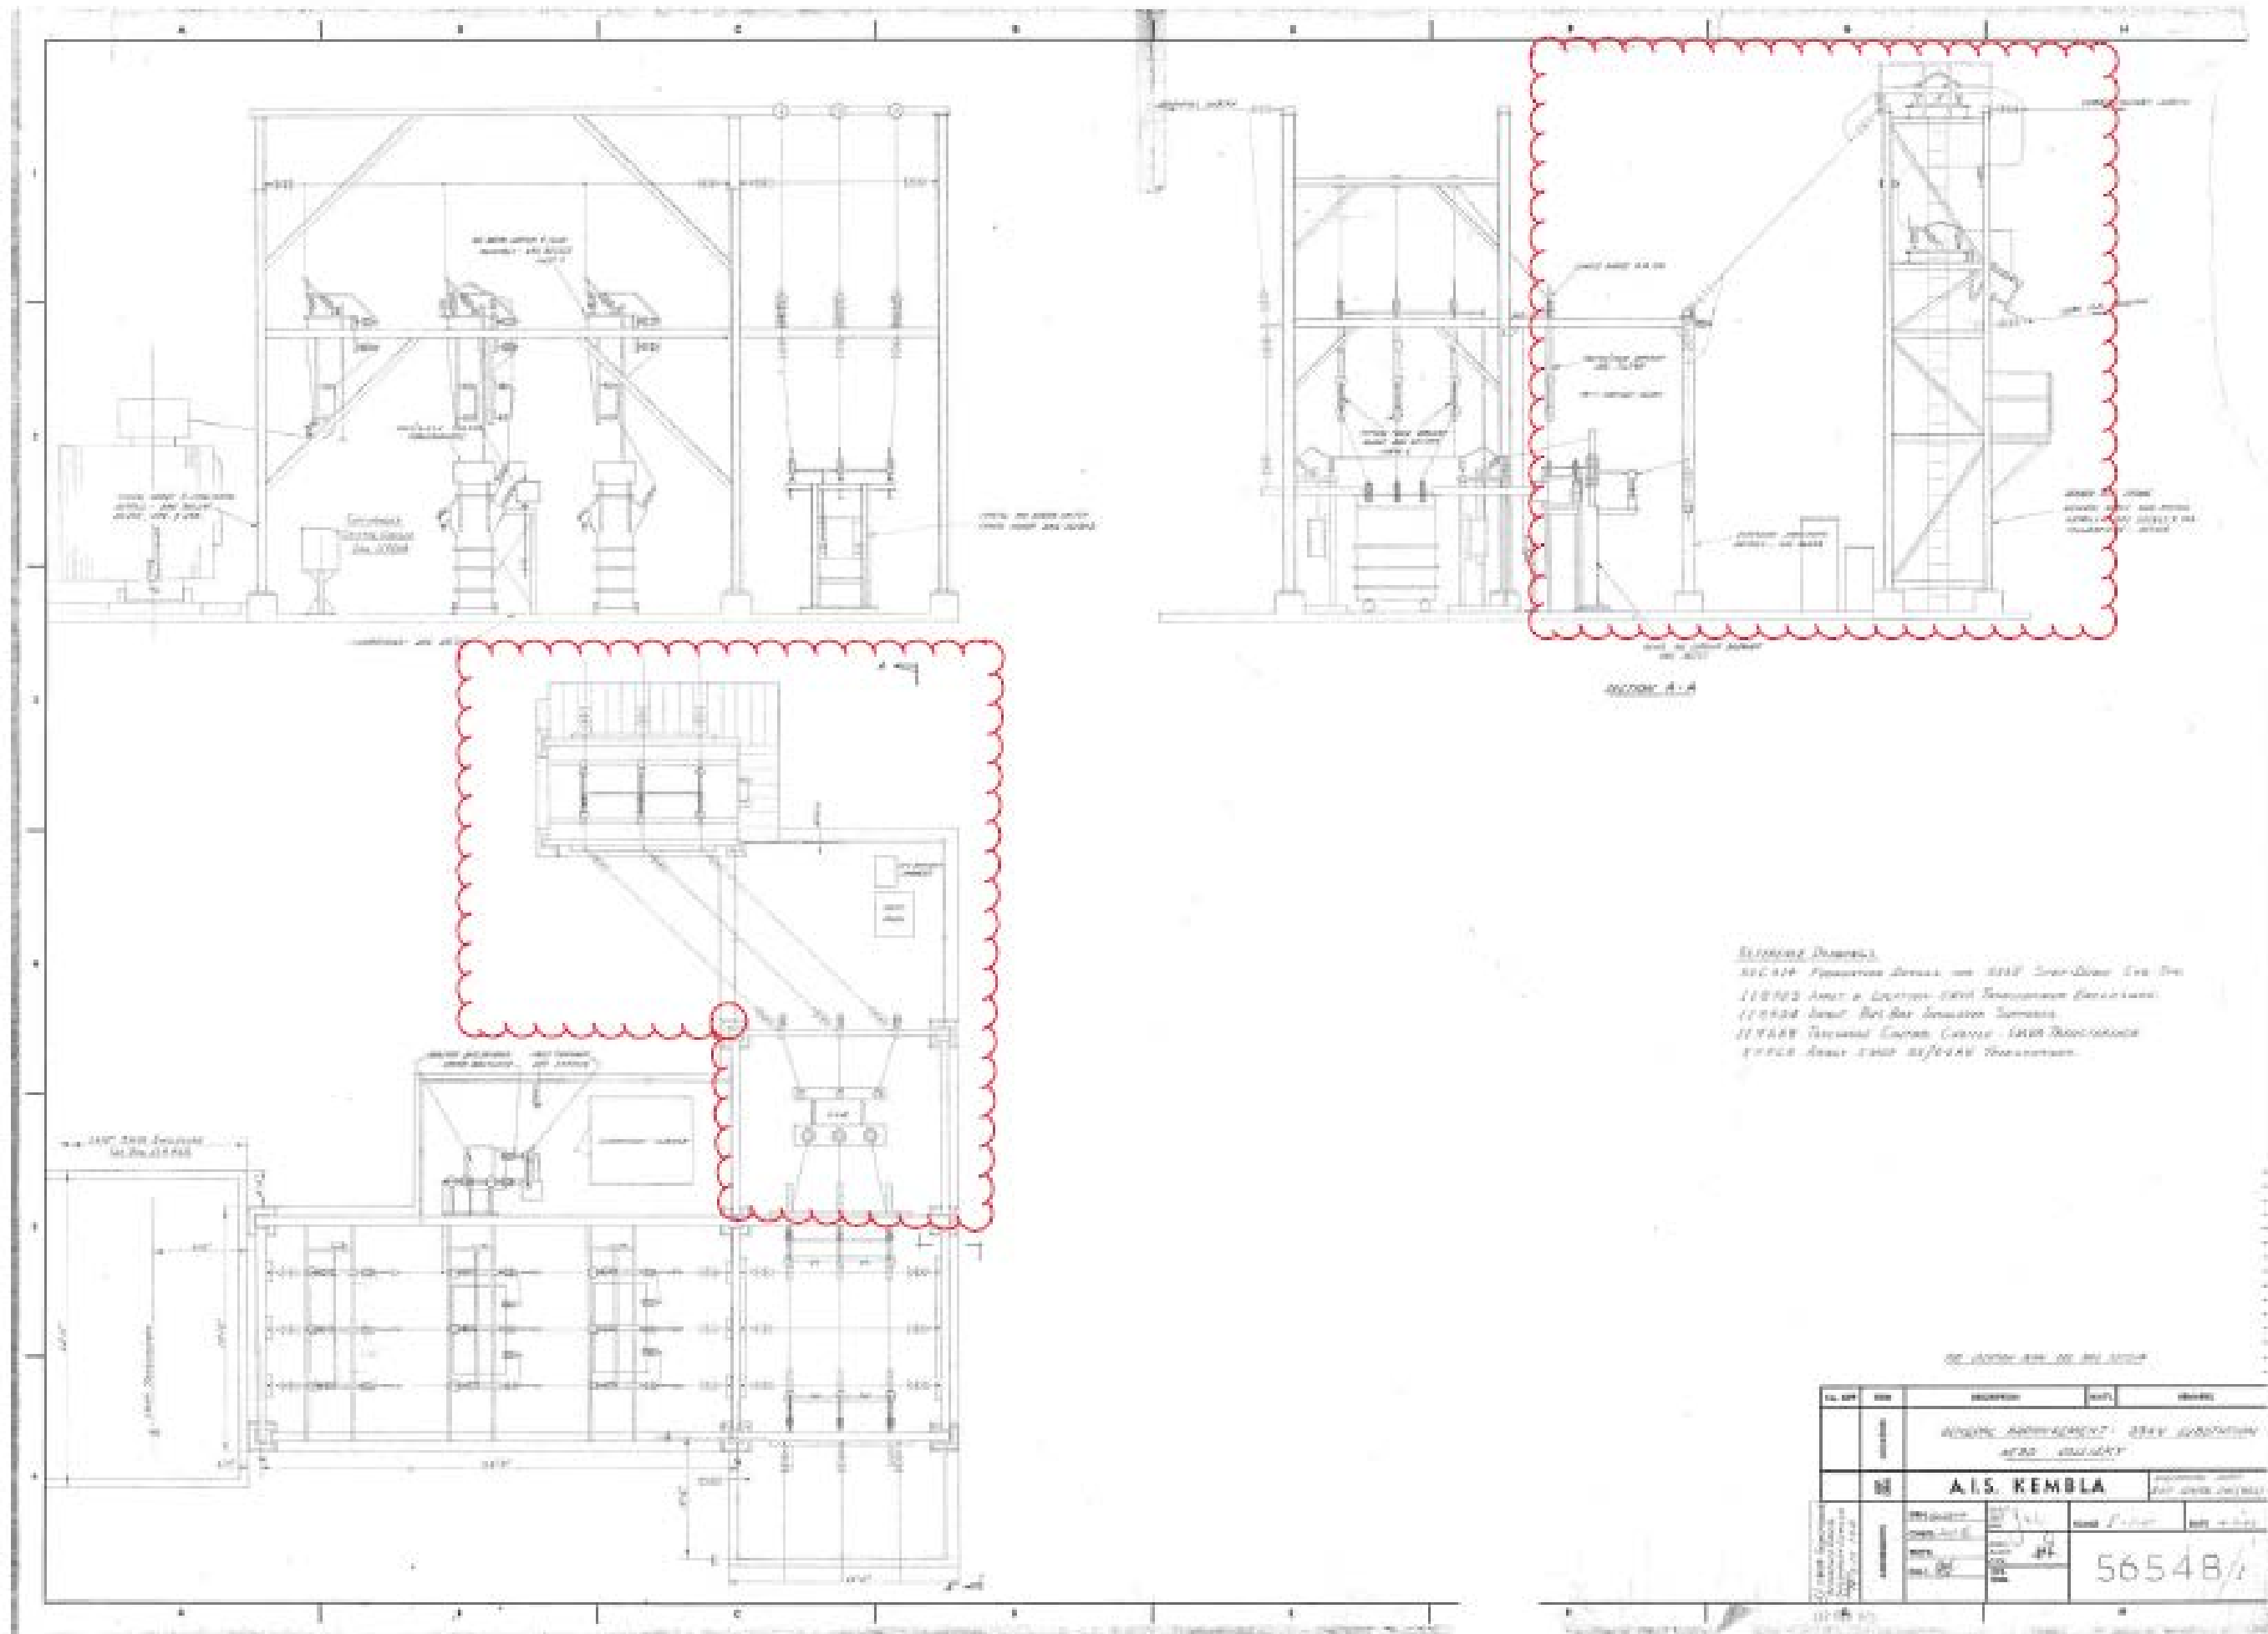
Dendrobium (Nebo) Surface Switchyard- section proposed to be demolished clouded
